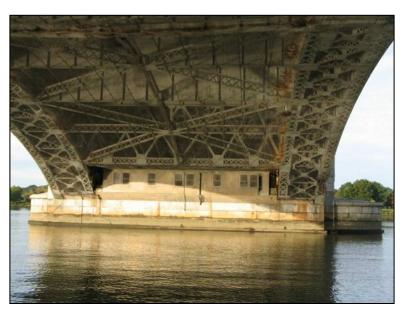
Steel truss bascule span that would be rehabilitated in place under Alternative 3
